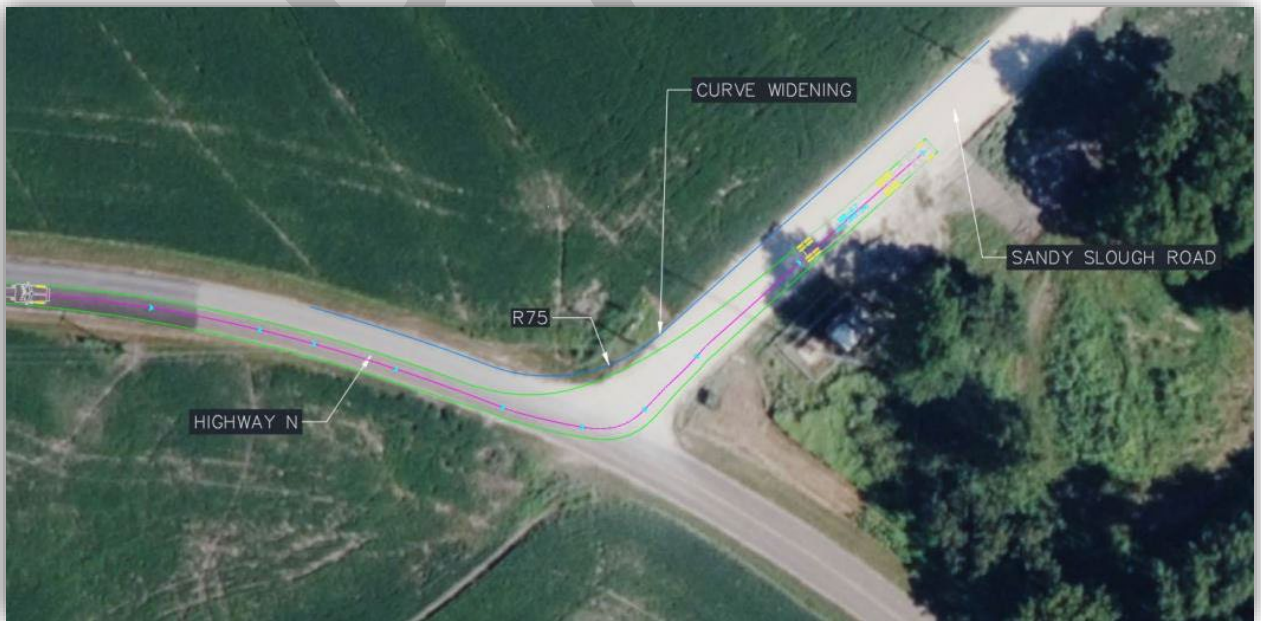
Required road improvements at the intersection of Highway N and Sandy Slough Road.
